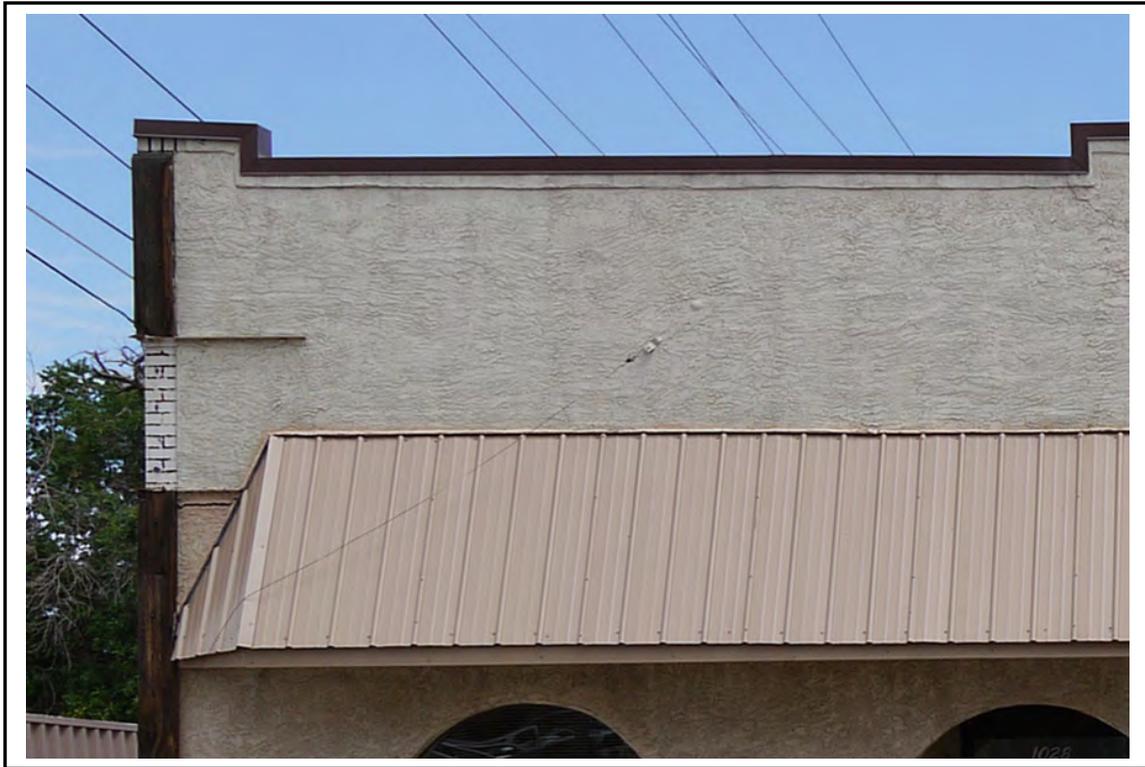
Detail view of missing post section, northwest corner, 1028 Main Street.
